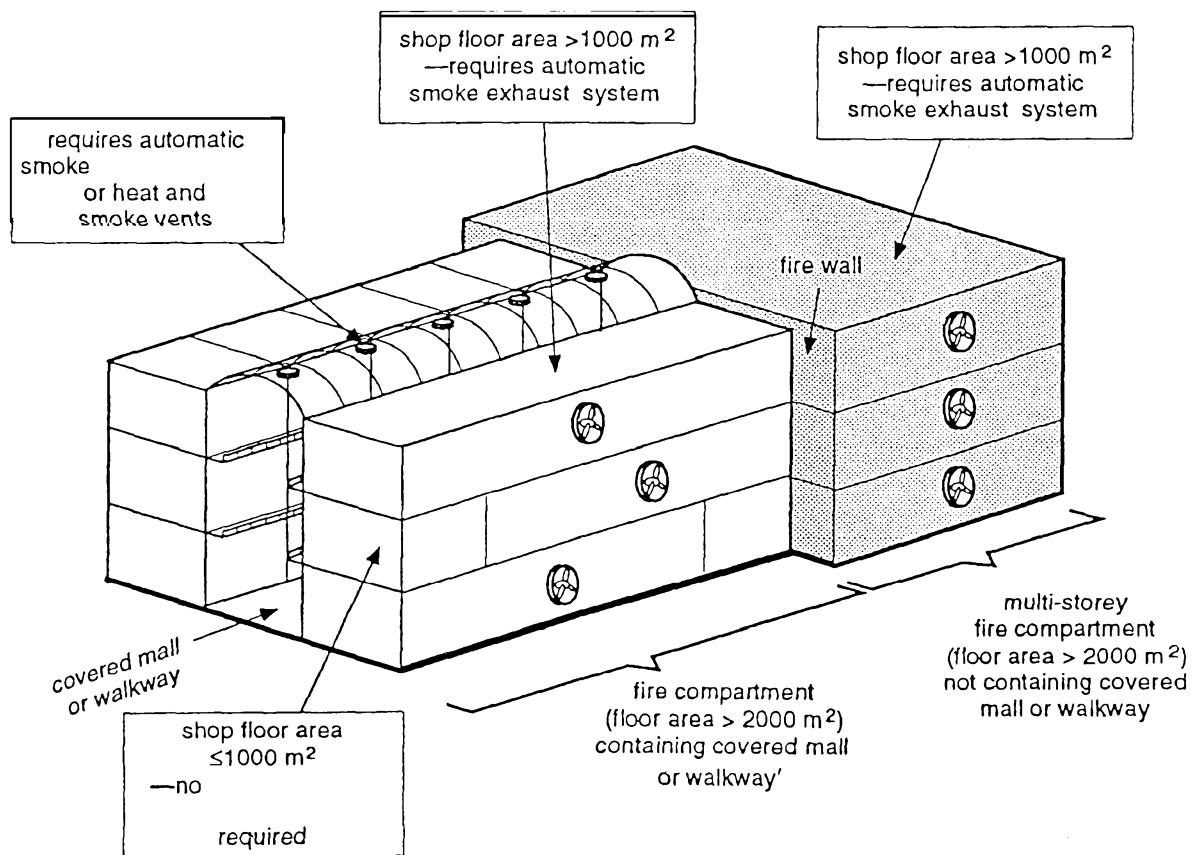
SPRINKLERED THREE STOREY BUILDING
